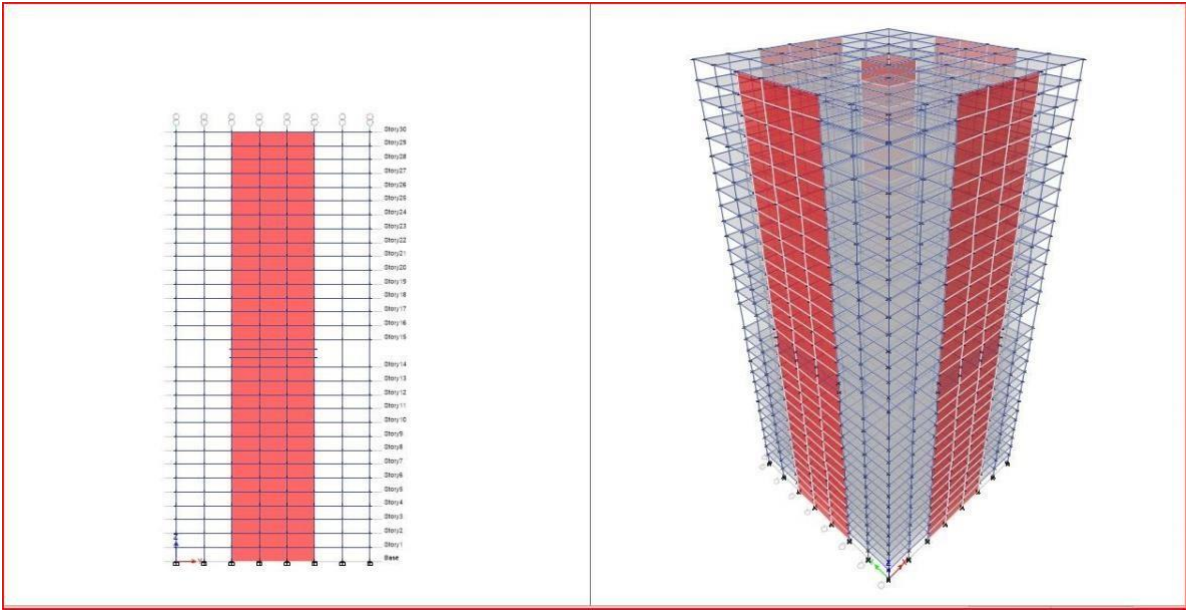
Elevation and 3-D view of Soft Story model with horizontal stiffeners at mid for G+30
